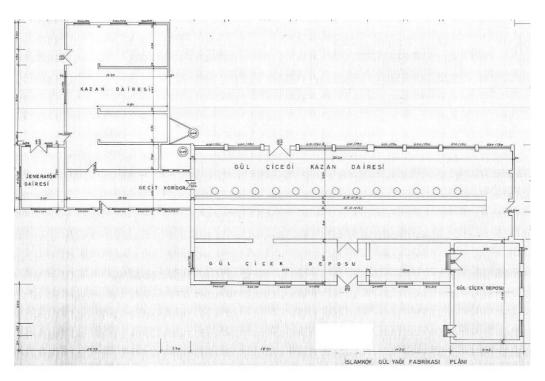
Islamköy Rose Oil Factory Ground Floor Plan.
